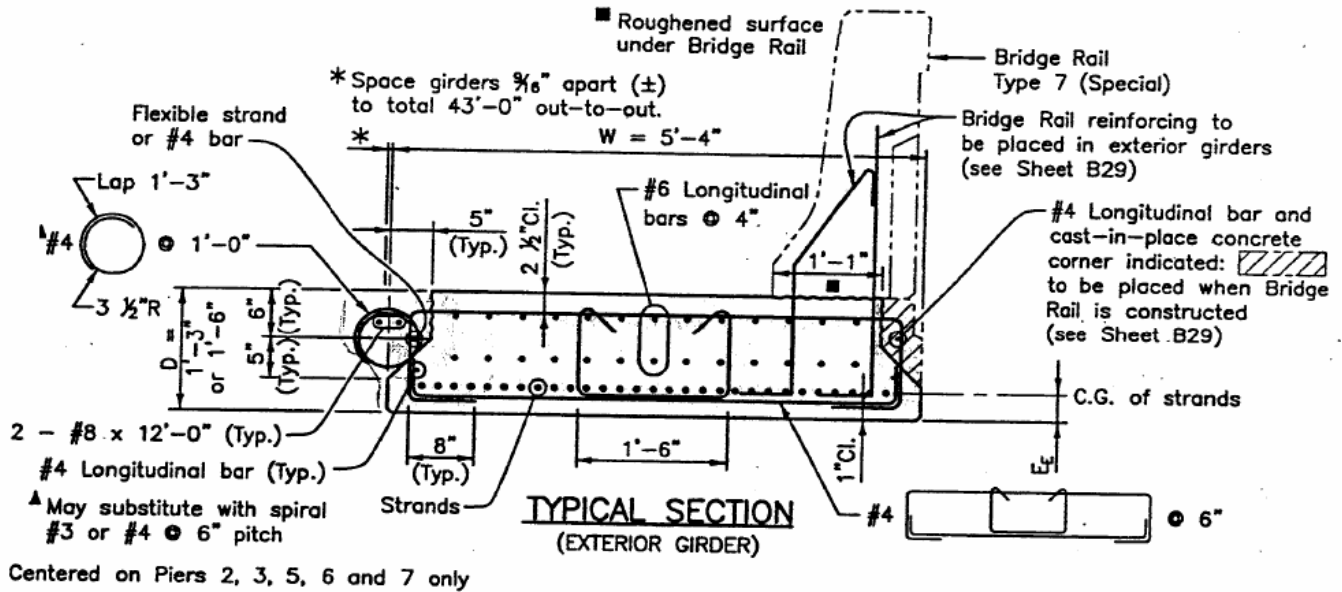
Typical cross section of the exterior precast panel
